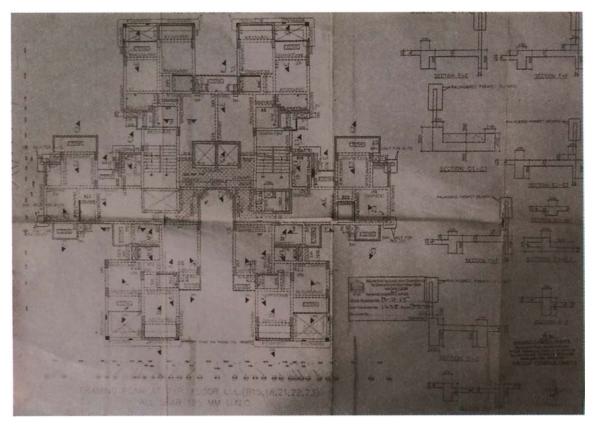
Illustration O/ Construction drawings used in sites
